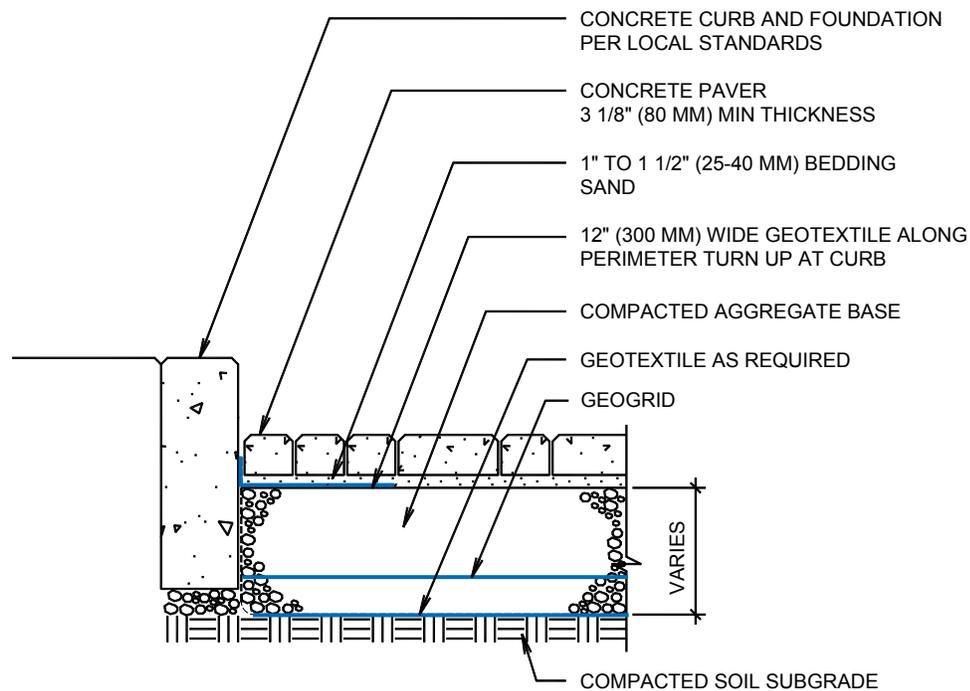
Interlocking concrete pavement with geogrid in the base for reinforcement
